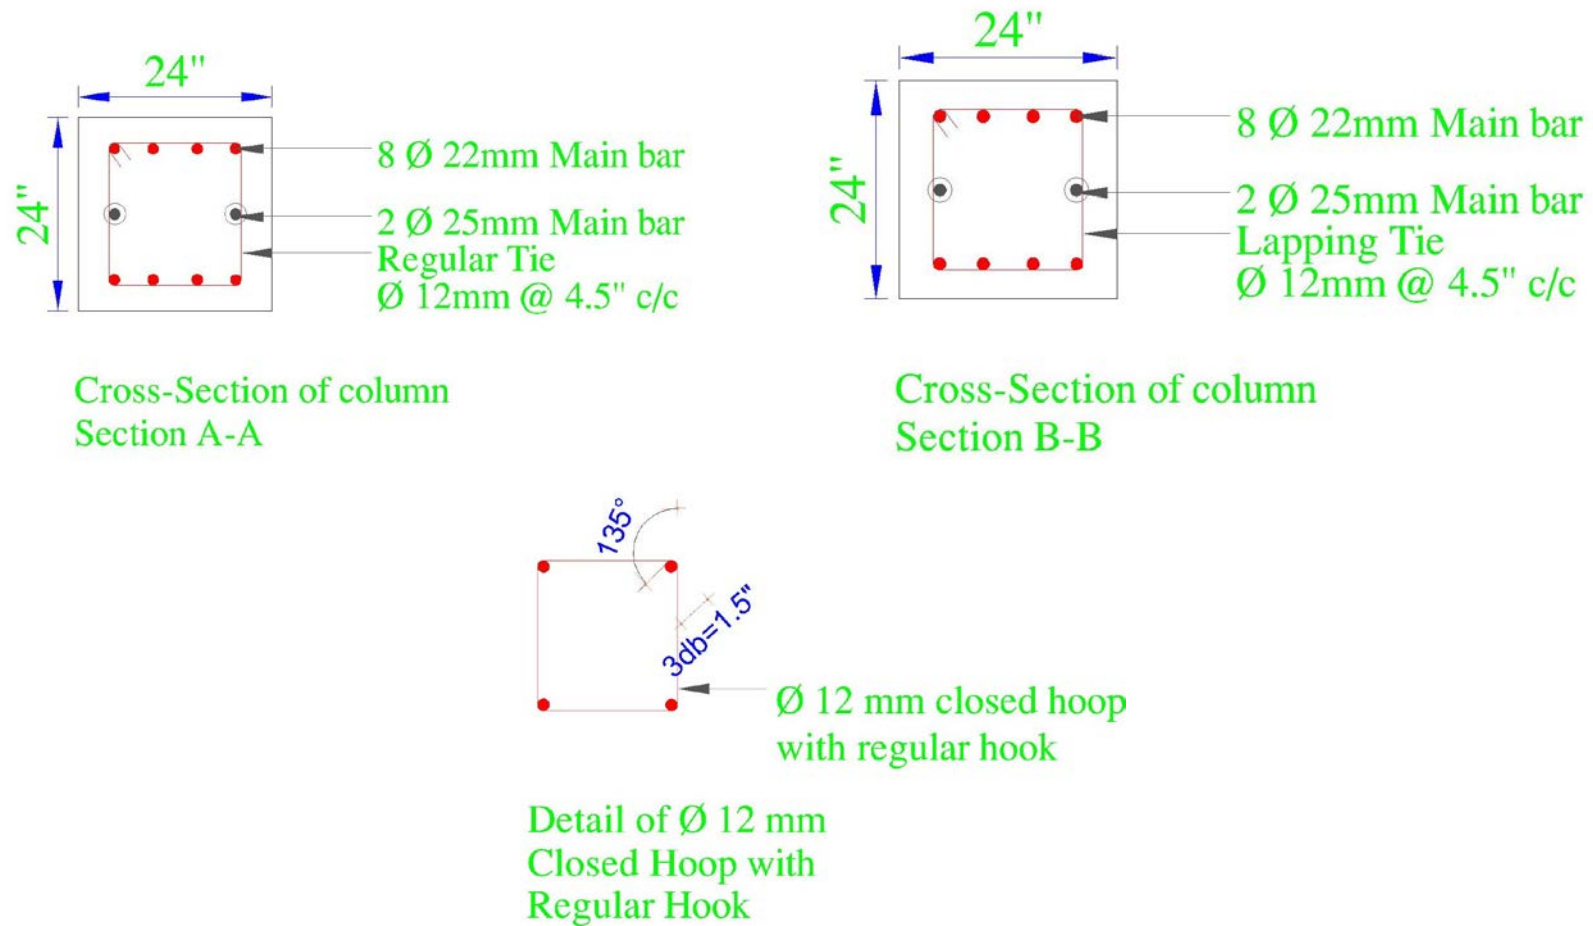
Details of Cross Sections, Ties and Closed Hoop
